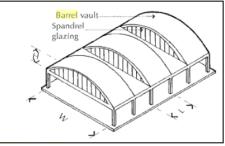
Barrel vault shell roof construction (Emmitt, 2006.pp 252)
